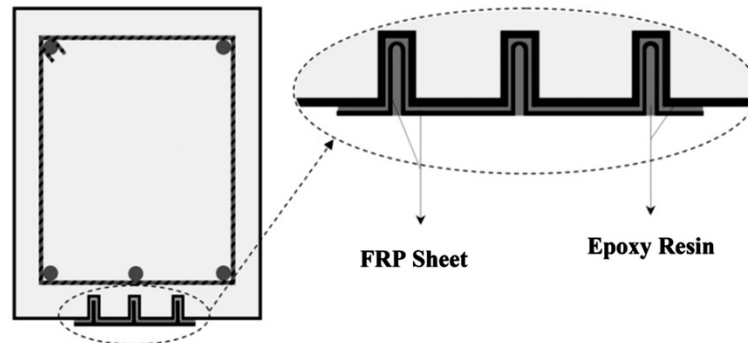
Externally Bonded Reinforcement in Grooves (EBRIG) Technique.
